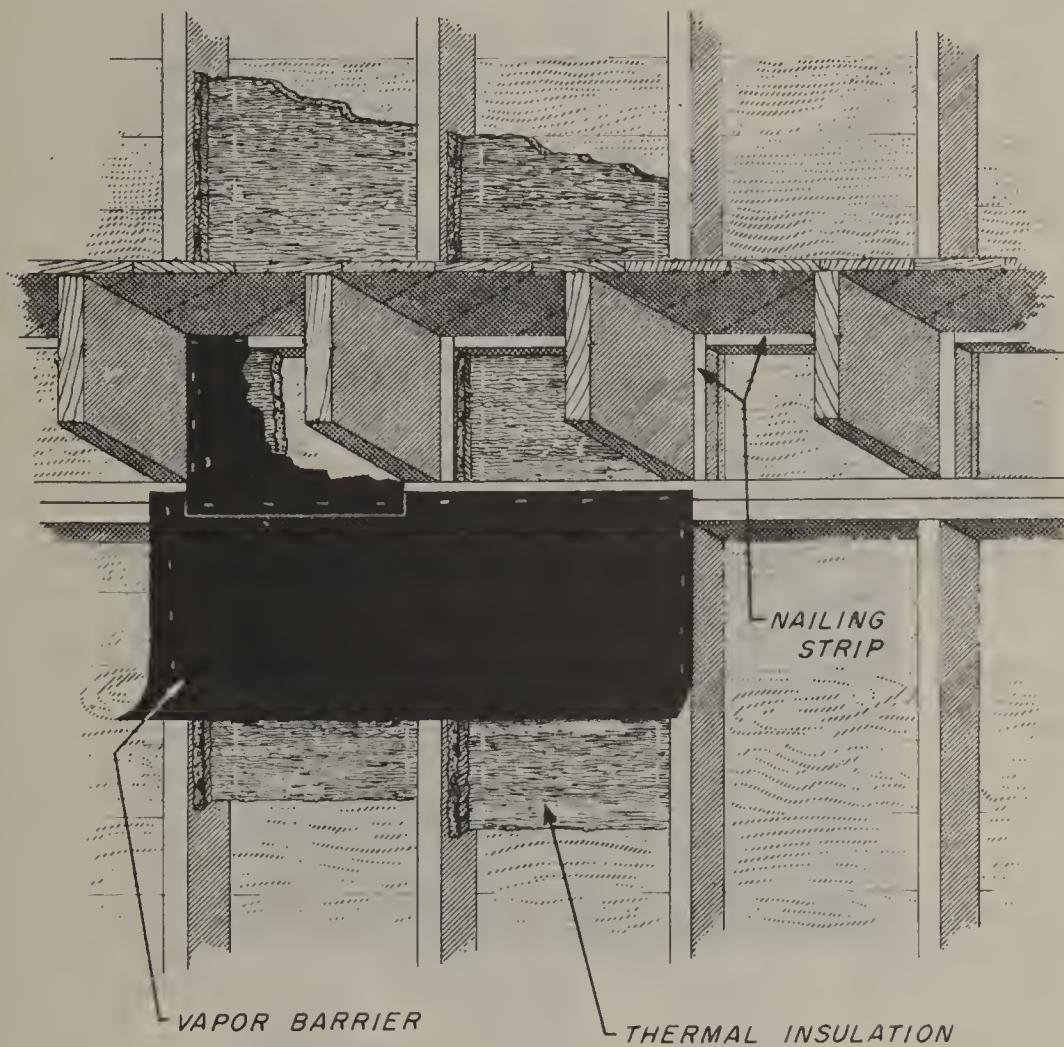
Side wall, second-floor level, platform construction.
